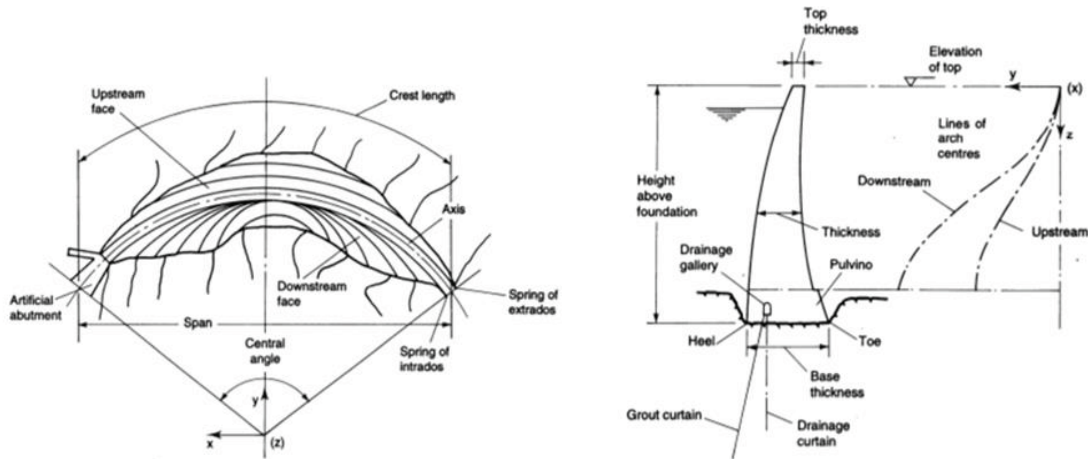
(Left) Plan of an arch dam; (Right) Central Cantilever of the arch dam (Source: CISM courses and Lectures No. 367[26])
